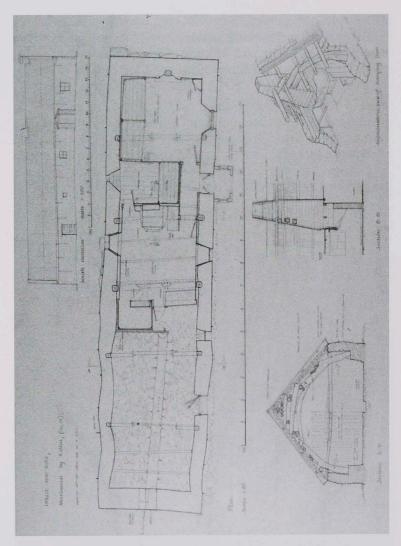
Survey drawings, 1991. Top, south elevation of cottage: note the size and disposition of windows and doors. Centre, floor plan: right to left, the best room with box beds; closet or press room; kitchen with hanging lum and box bed. The cupboard originally fronting the kitchen box bed, in situ in 1991, is now in the 'dairy' between the byre and the kitchen. Note the dresser flanking the entry to the byre; the byre with its central drainage channel and doorway. Bottom, left to right: section A-A showing a cruck frame and collars with the profile of the cruck blades in mural slots and (faintly at the left) the re-positioned log screen separating the byre from the dairy; section of chinney and hanging lum; axonometric drawing of hanging lum. (RCAHMS)
